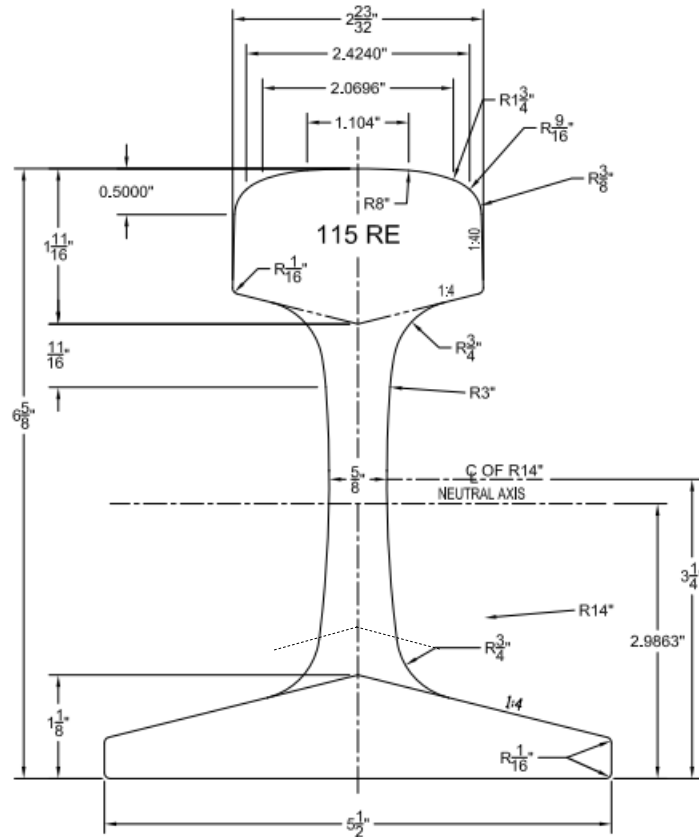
The 115 RE rail section (AREMA, 2011)
